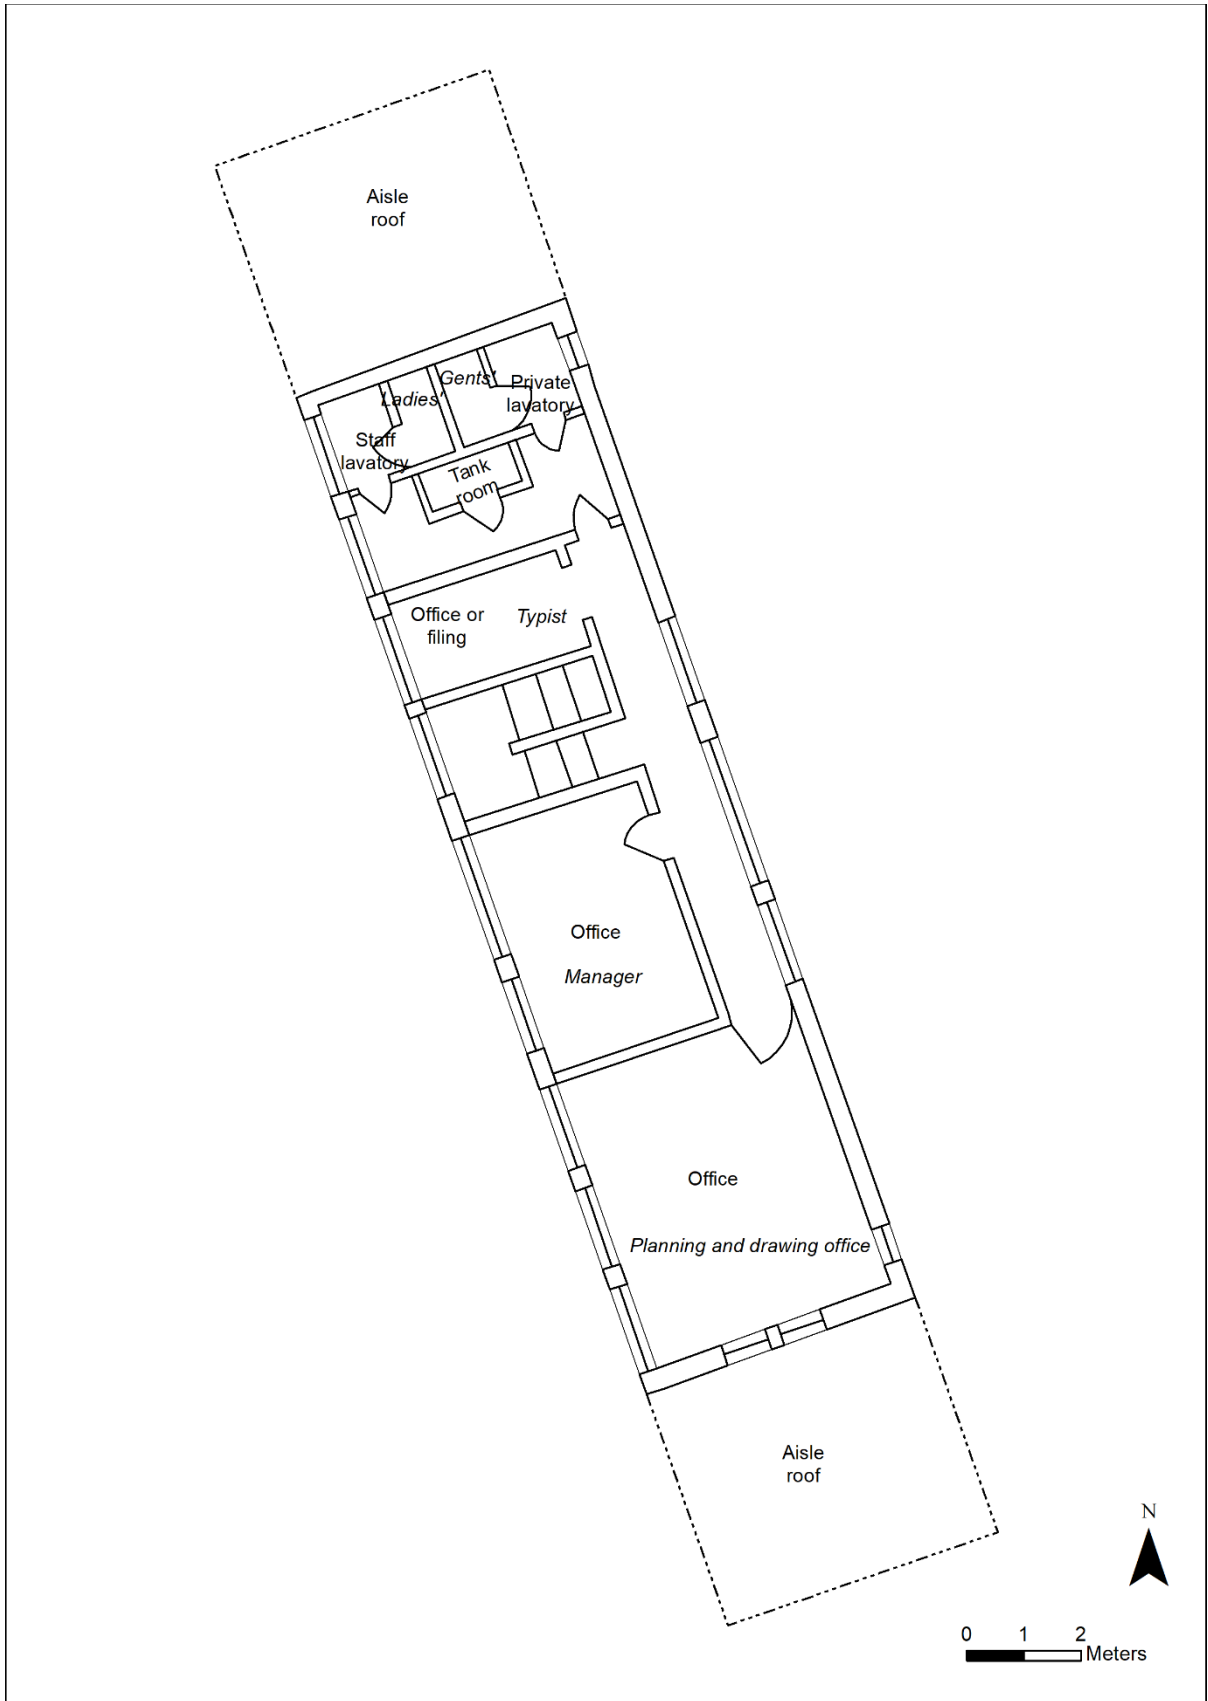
The L50 first-floor offices as built based on building control plan TWAM CB.GA/BC/plan/NET/41.
